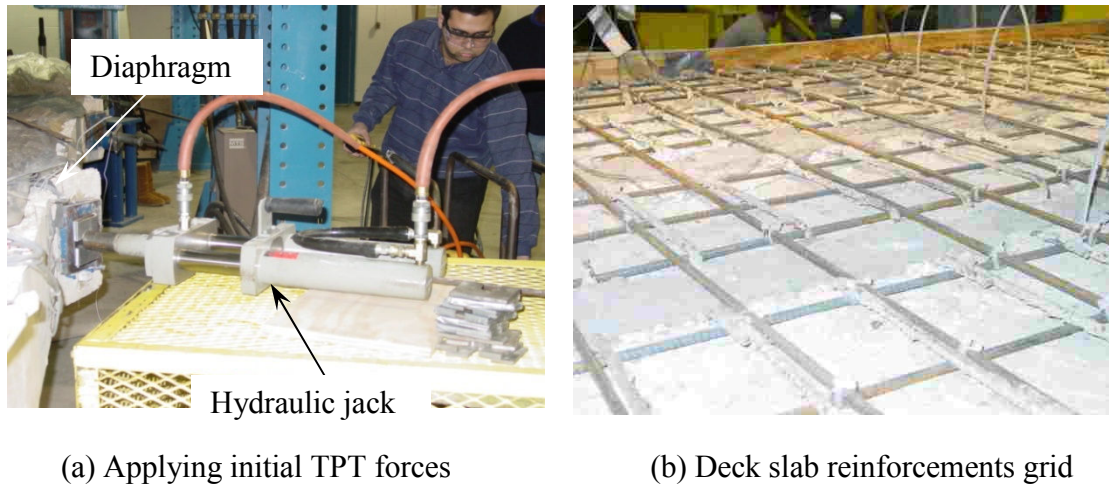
Application of initial TPT forces and casting of deck slab.
